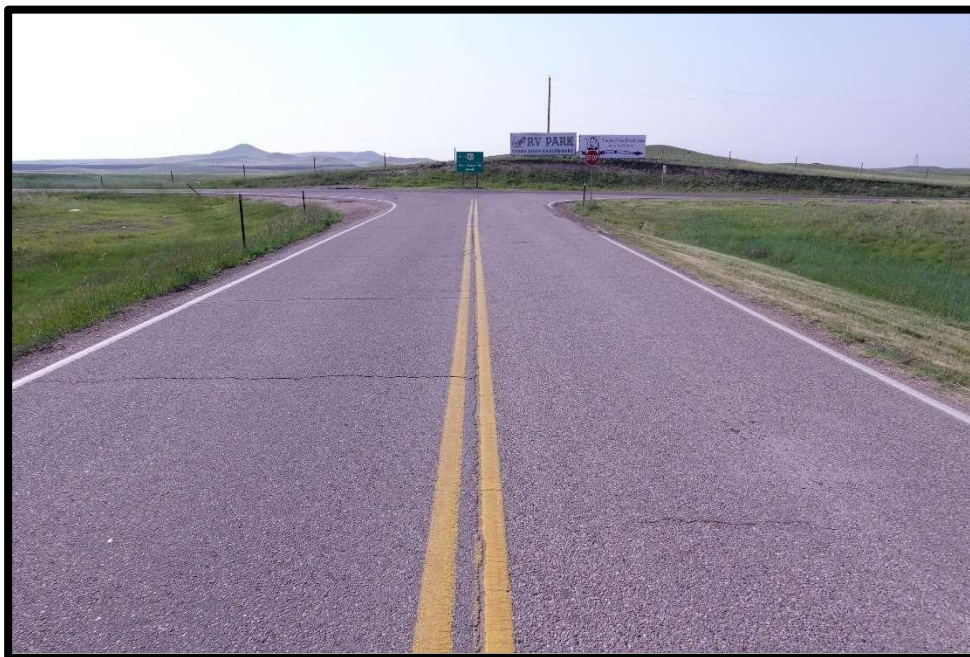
At-Grade Photo WY 223/Terry Ranch Road Intersection Looking East
